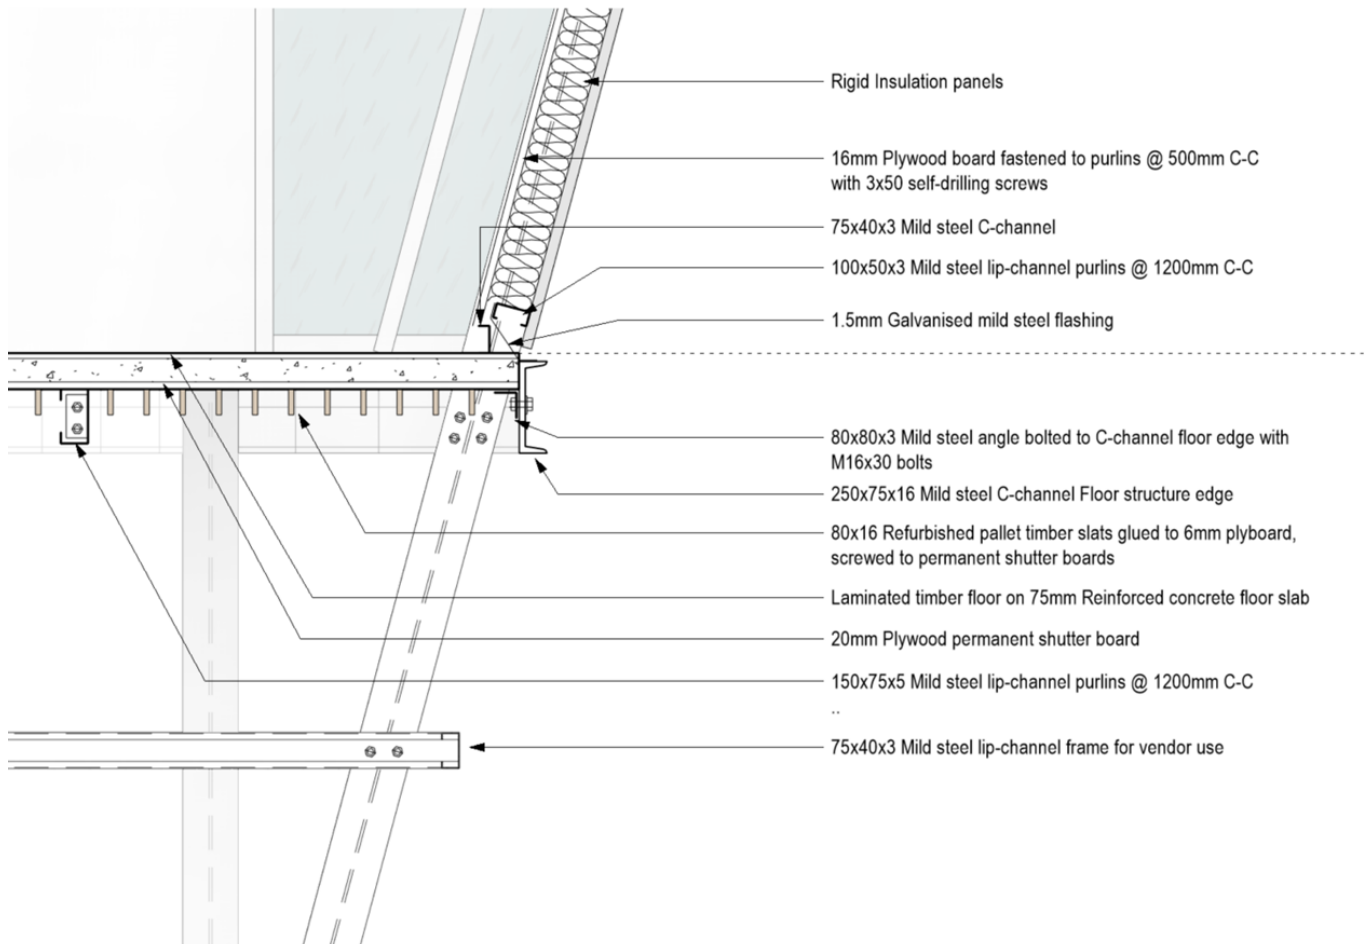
Detail 2: Floor to wall articulation (Author 2020)
